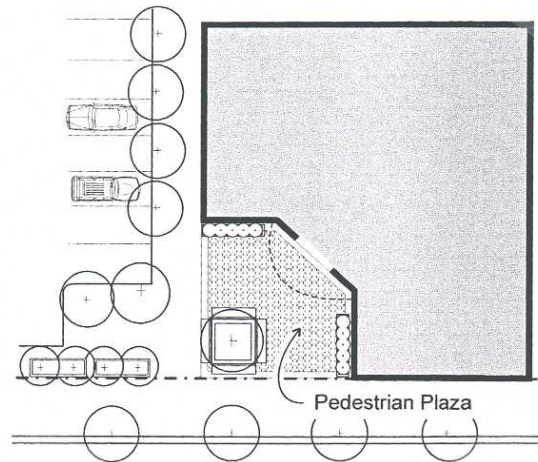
(a)-1. The orientation of this pedestrian plaza is well suited to provide a pleasant outdoor space, convenient pedestrian access, and landscaping enhancement of the building.
